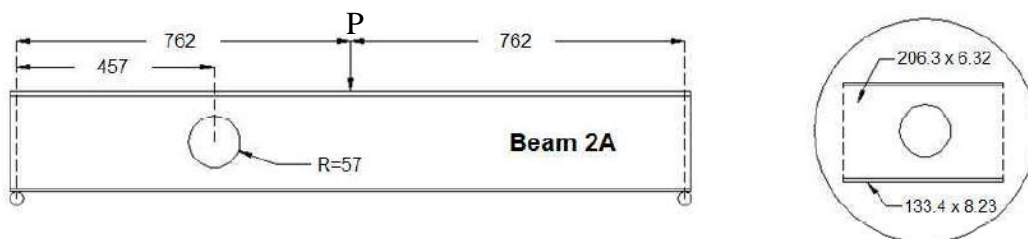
Specimen Geometry (all dimensions in mm) [13]
